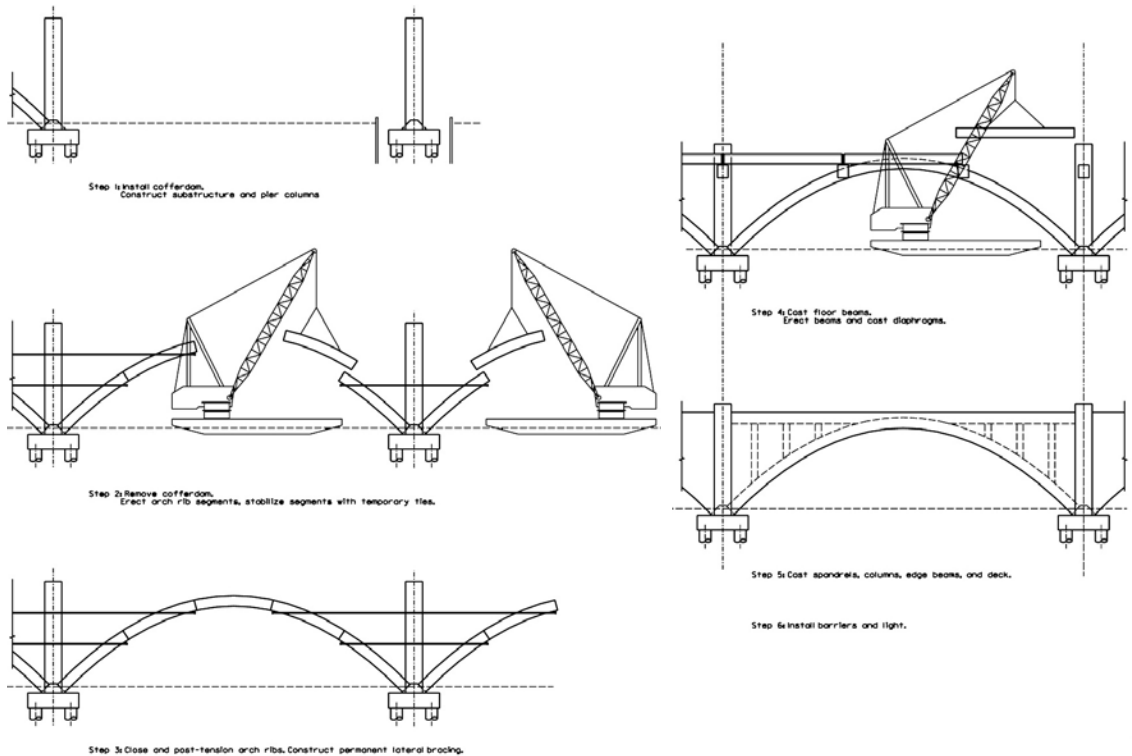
Concrete Deck Arch Precast Construction Sequence
